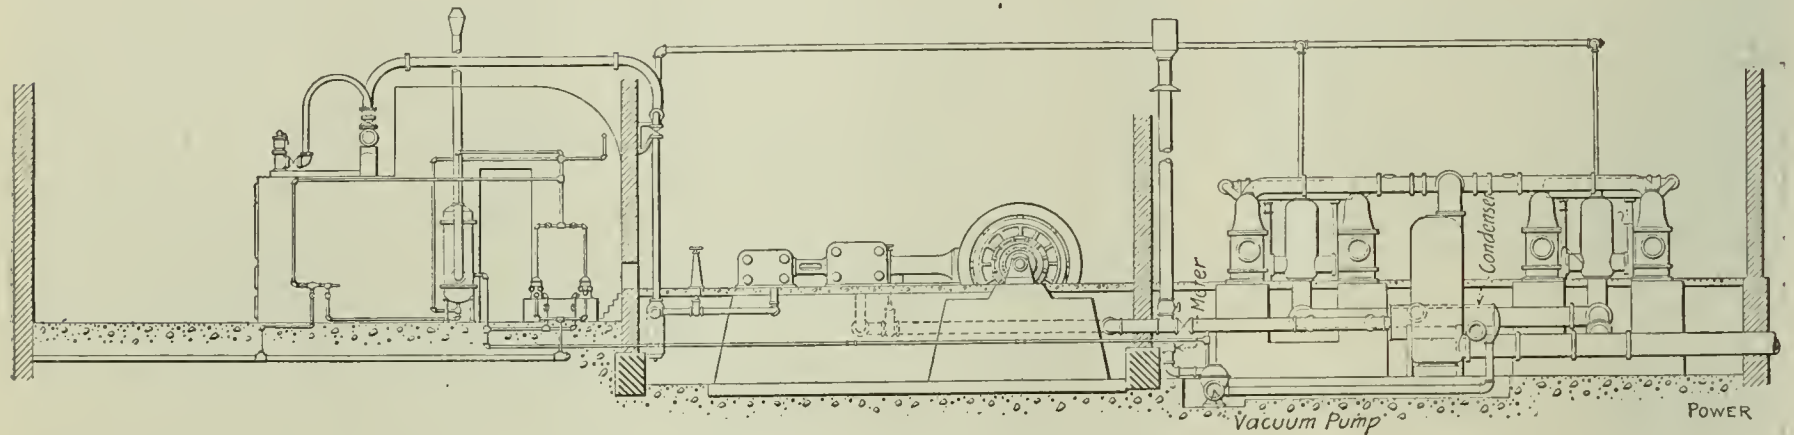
SECTIONAL ELEVATION OF THE PLANT
